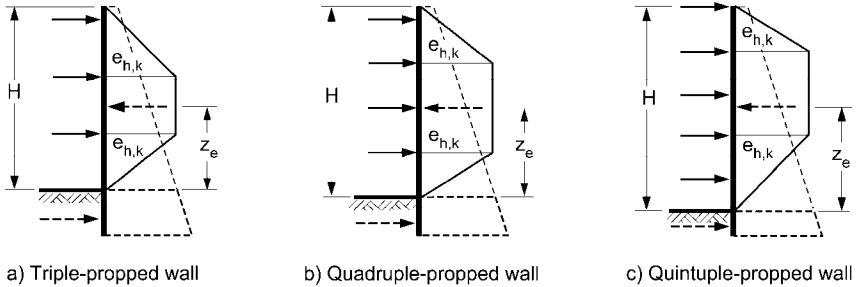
Pressure diagrams for triple- or multiple-propped soldier pile walls
